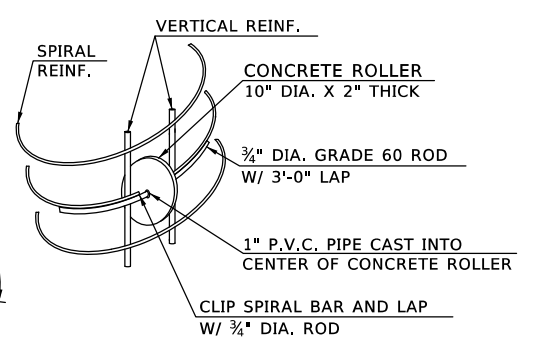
DETAIL OF DRILLED SHAFT ROLLER PLACEMENT
